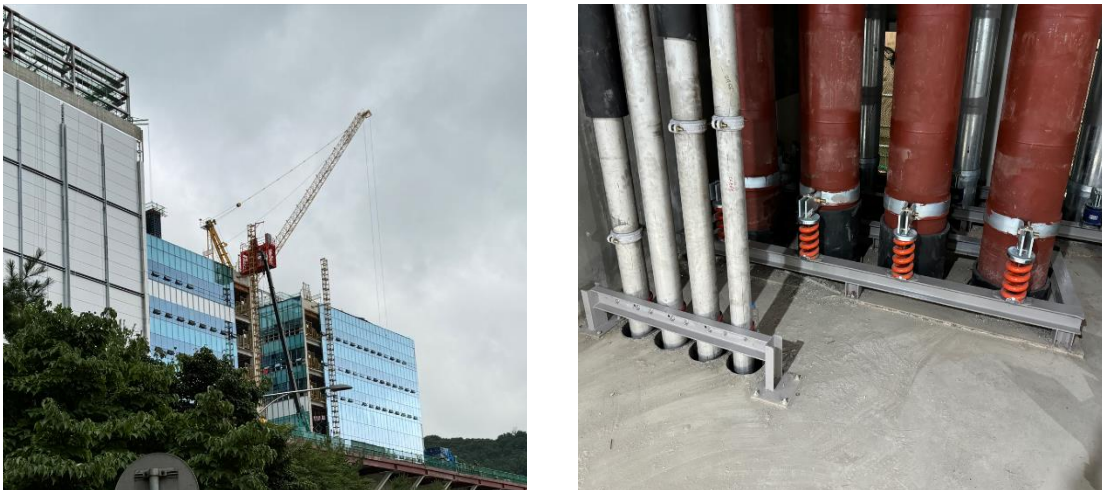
Data center project in Korea (left); detail of expansion anchors (MKT BZ3) connecting seismic bracing to the concrete structure (right).
